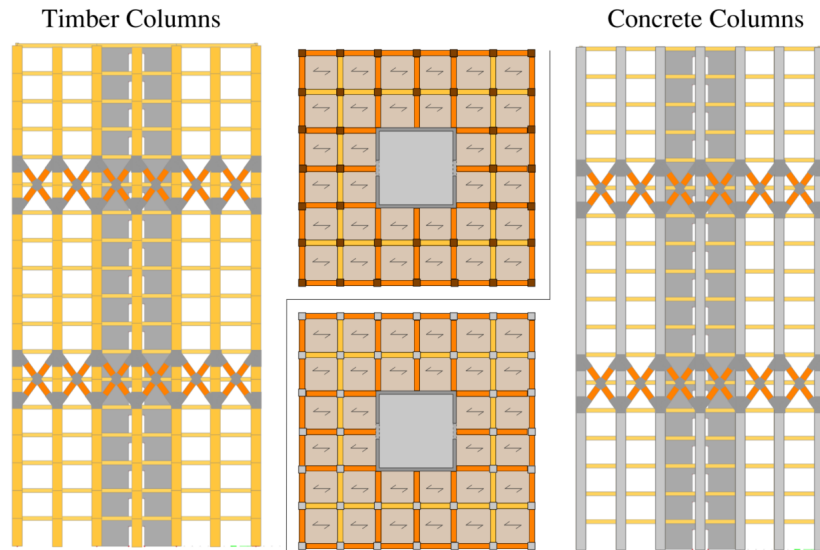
Side views of variant 2 for floor plan B with both timber and concrete columns
